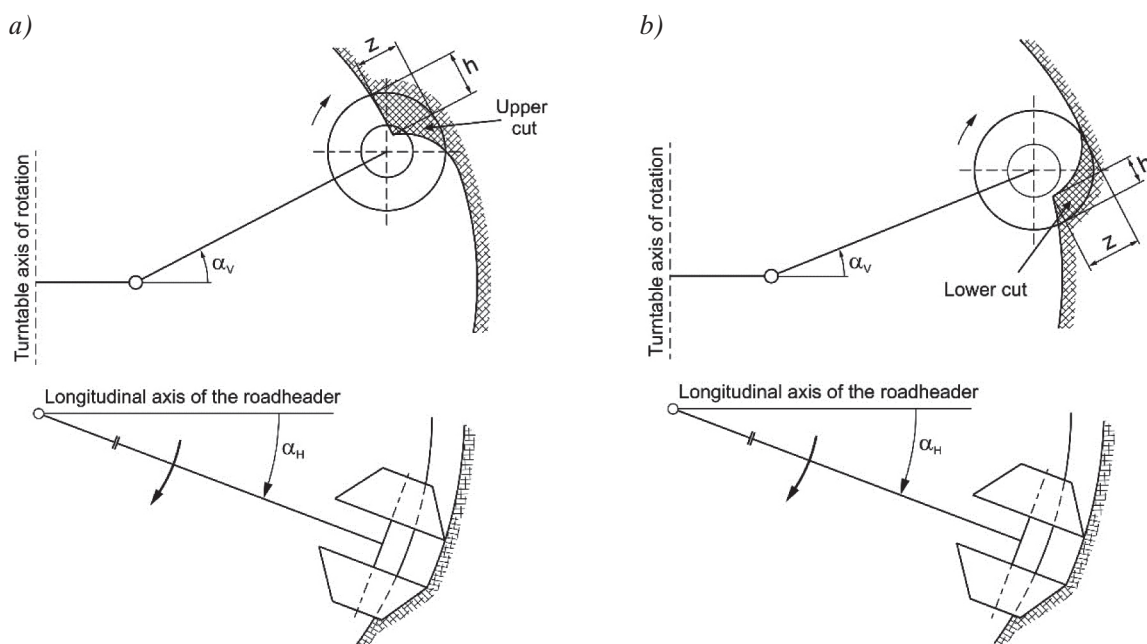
Cross-sections of upper cuts (a) and lower cuts (b) performed using transverse cutting heads during their movement parallel to floor
